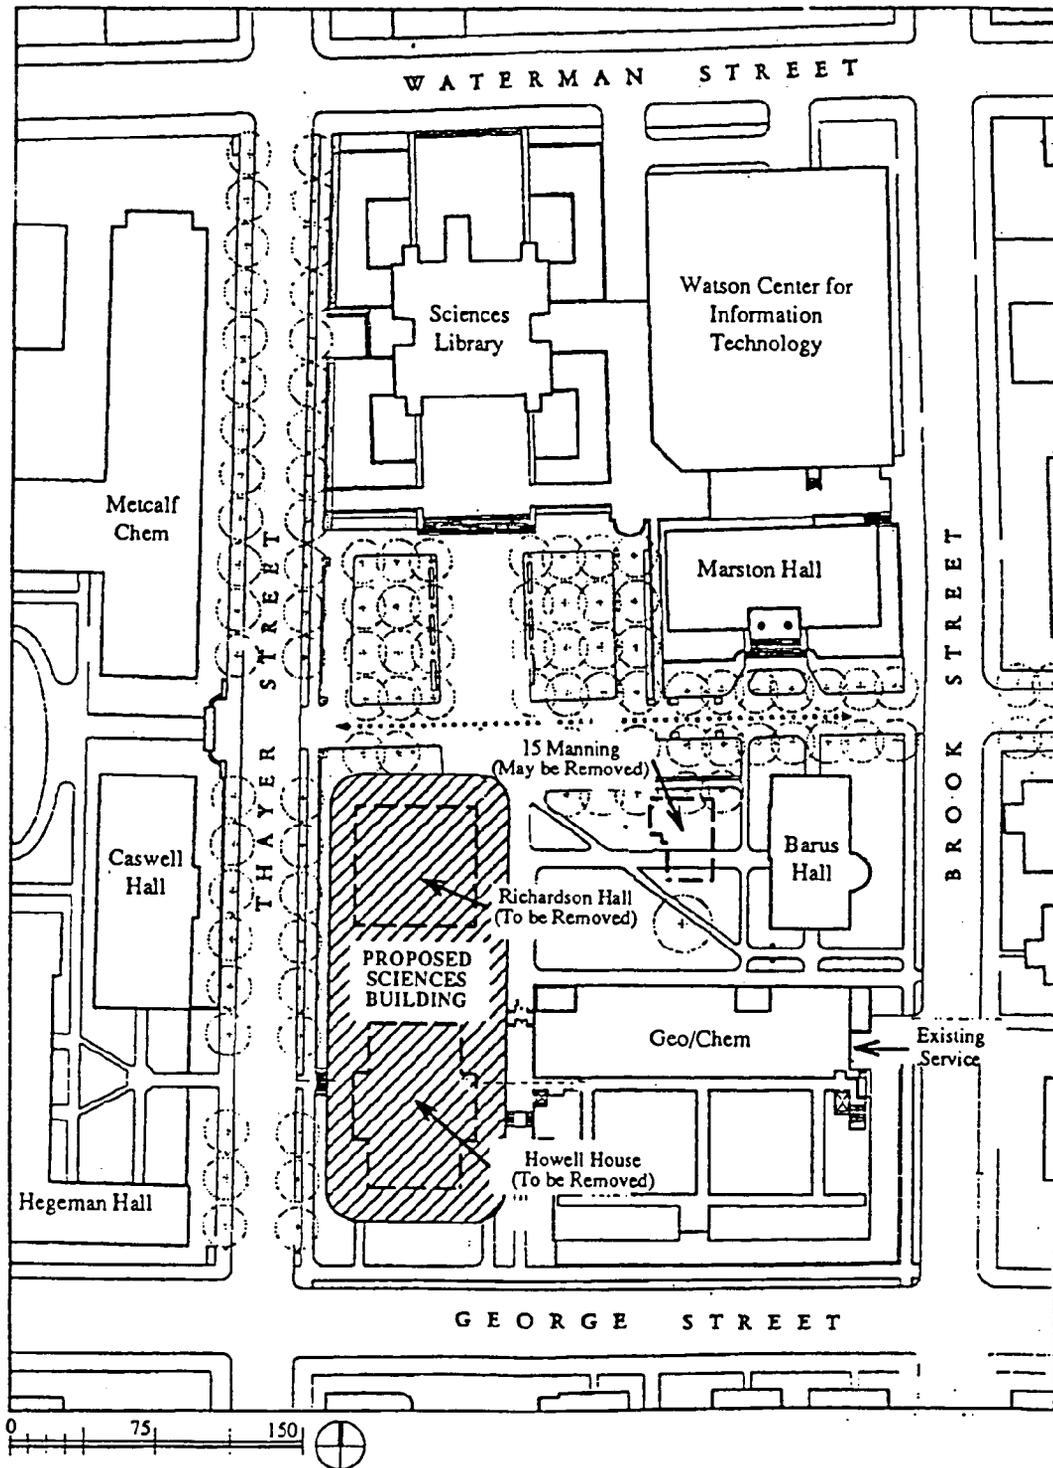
Site Plan for Proposed Undergraduate Sciences Teaching Building
